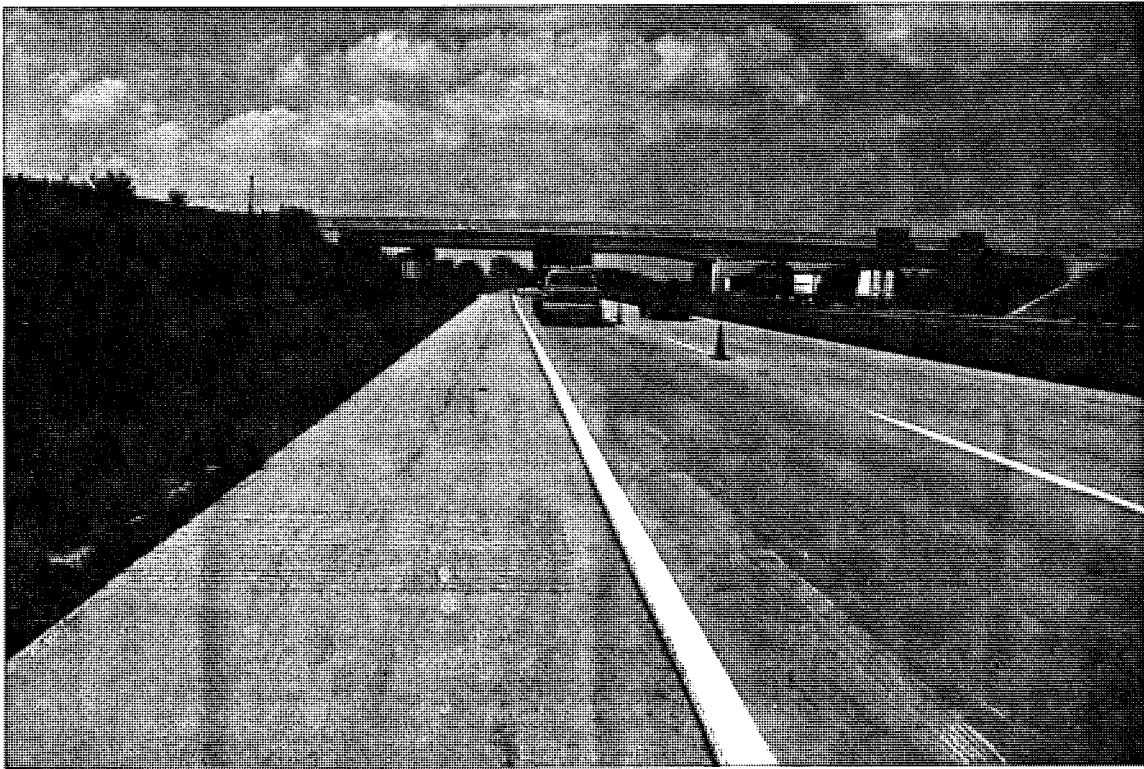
A overview looking west on CSN# 19042-02233A (Section C) EB. Slabs are 41 ft long. The concrete shoulder slabs have the same length.
